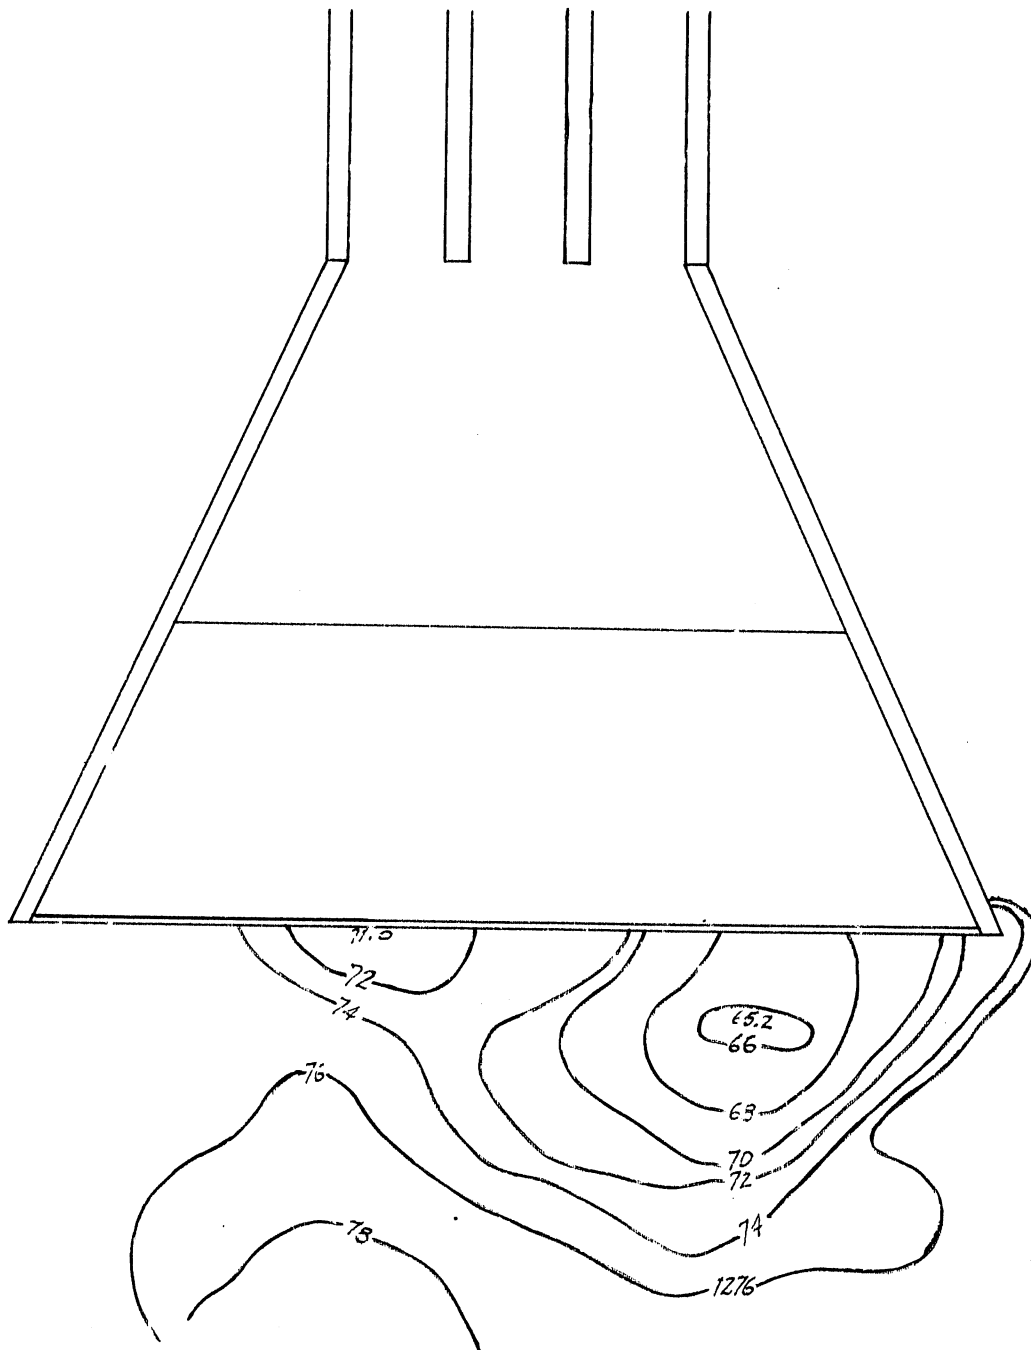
Plan of Downstream Erosion after a Flow Corresponding to 7000 cu ft per sec for a Two Hour Period with Original Apron and Gate Openings of September , 1941. Original Bed Elevation 1276.
